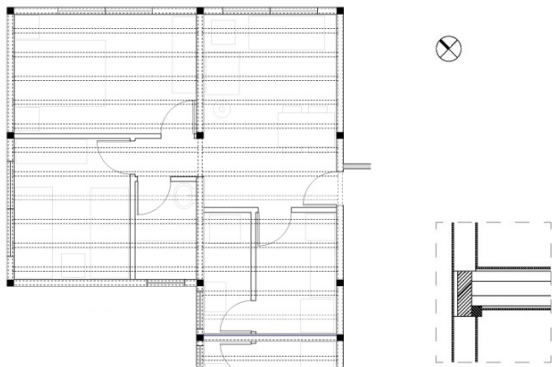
apartment plan with Pillar-Beam System (3) (section detail of wall-slab connection) – no scale drawing
